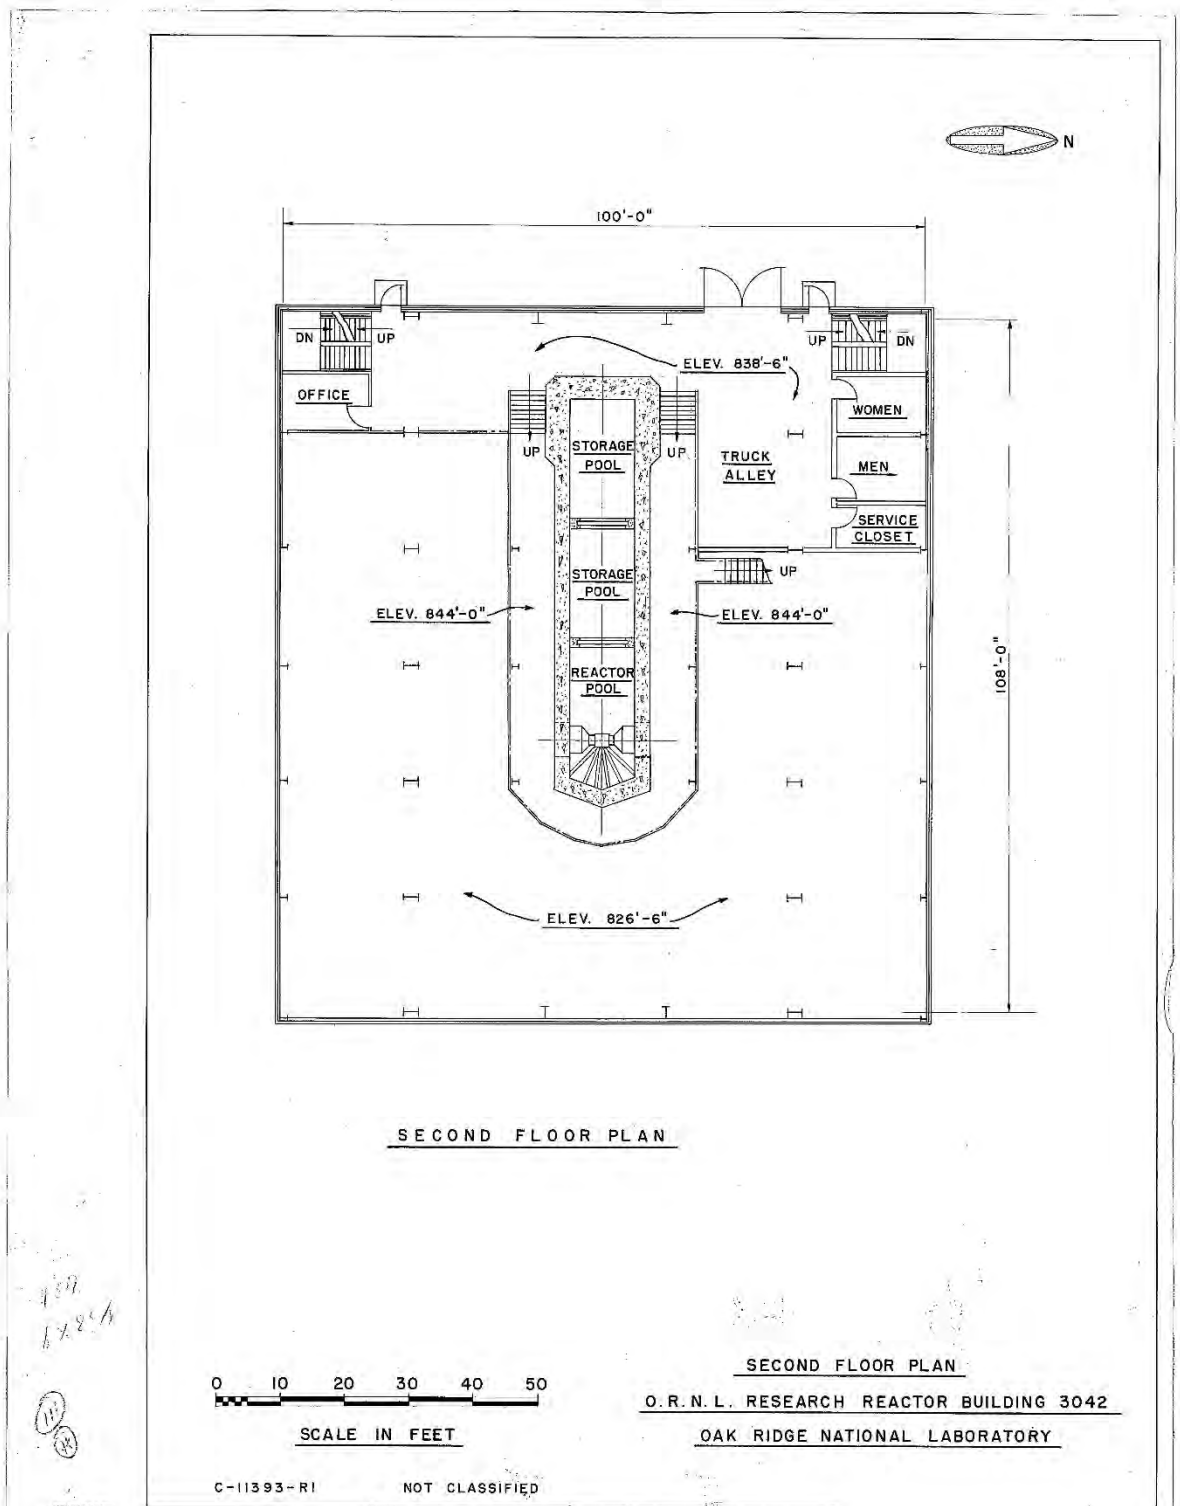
Second floor plan for Building 3042 (Oak Ridge National Laboratory, n.d.).
